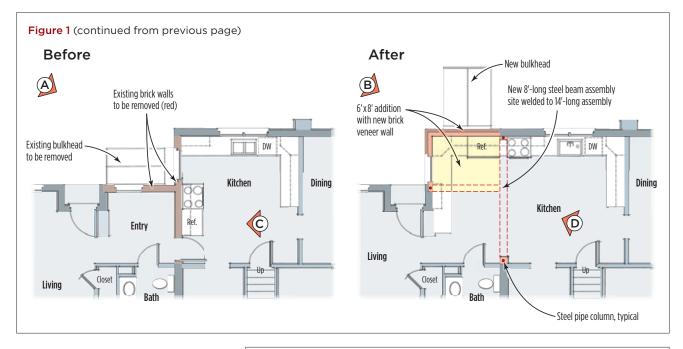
A 48-square-foot addition on the back corner of this brick home created a larger rectangular space for the kitchen. The project required removing the first-story structural brick wall in the inside corner and supporting the second story with steel beams. Note the boxed-out column at the right rear of the new refrigerator (D), which encloses a lally column positioned where the original exterior wall used to be.
